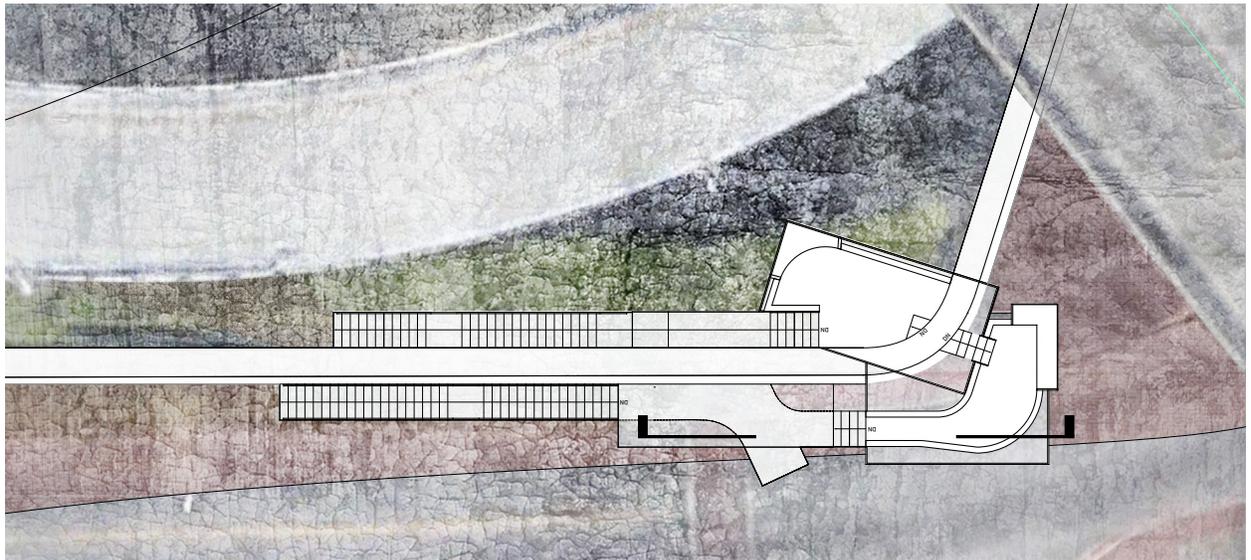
// Wall Soundscape Ladder Plan // By team
